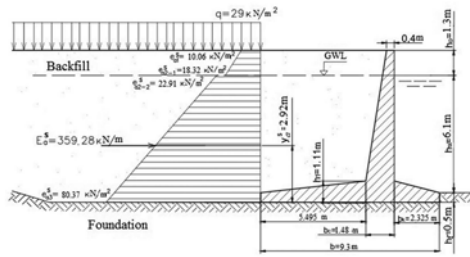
Diagram of active lateral pressure on a reinforced concrete corner retaining wall under seismic load of 9 points.
